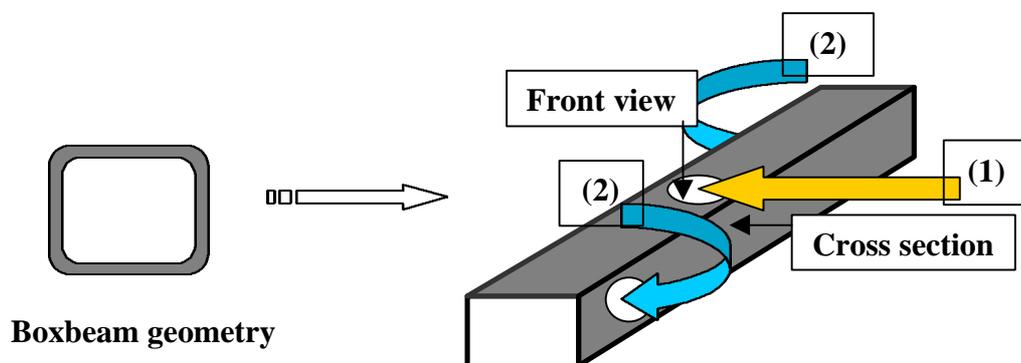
Example of pultruded shape and damages and repairs sites configurations
